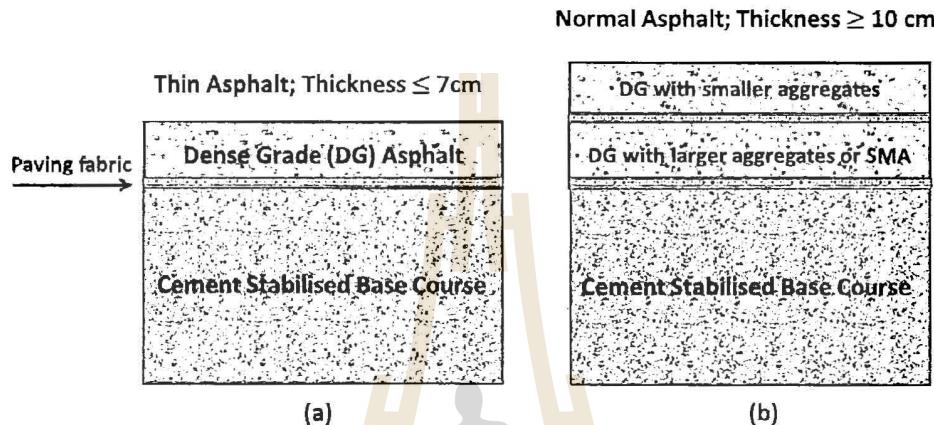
Paving fabrics in proposed pavement treatment for existing Thailand pavements
